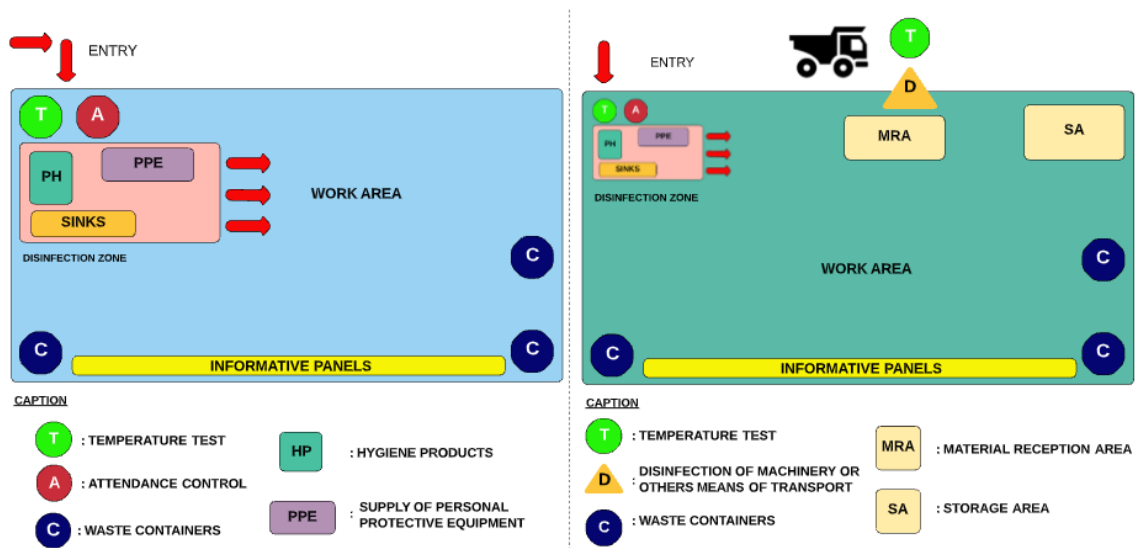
Proposed layout of the work area on site and layout of the materials reception area, applying preventive sanitary measures.
